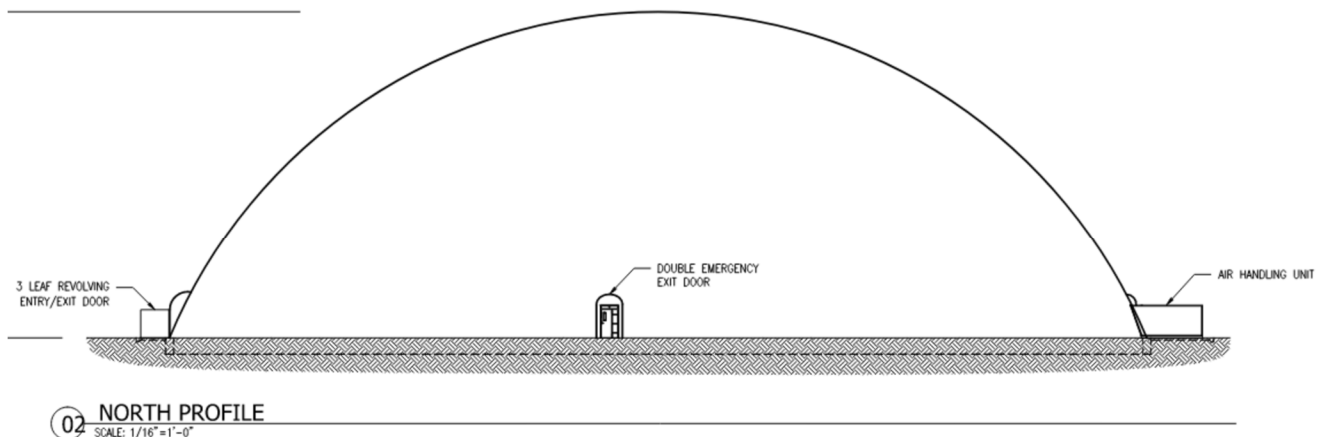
North elevation (front entrance) facing NW Ashurst Dr.
